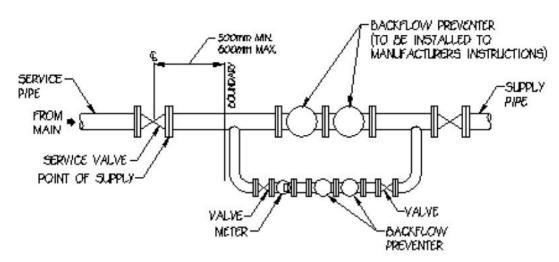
FIRE CONNECTION - HYDRANTS OR SPRINKLERS
